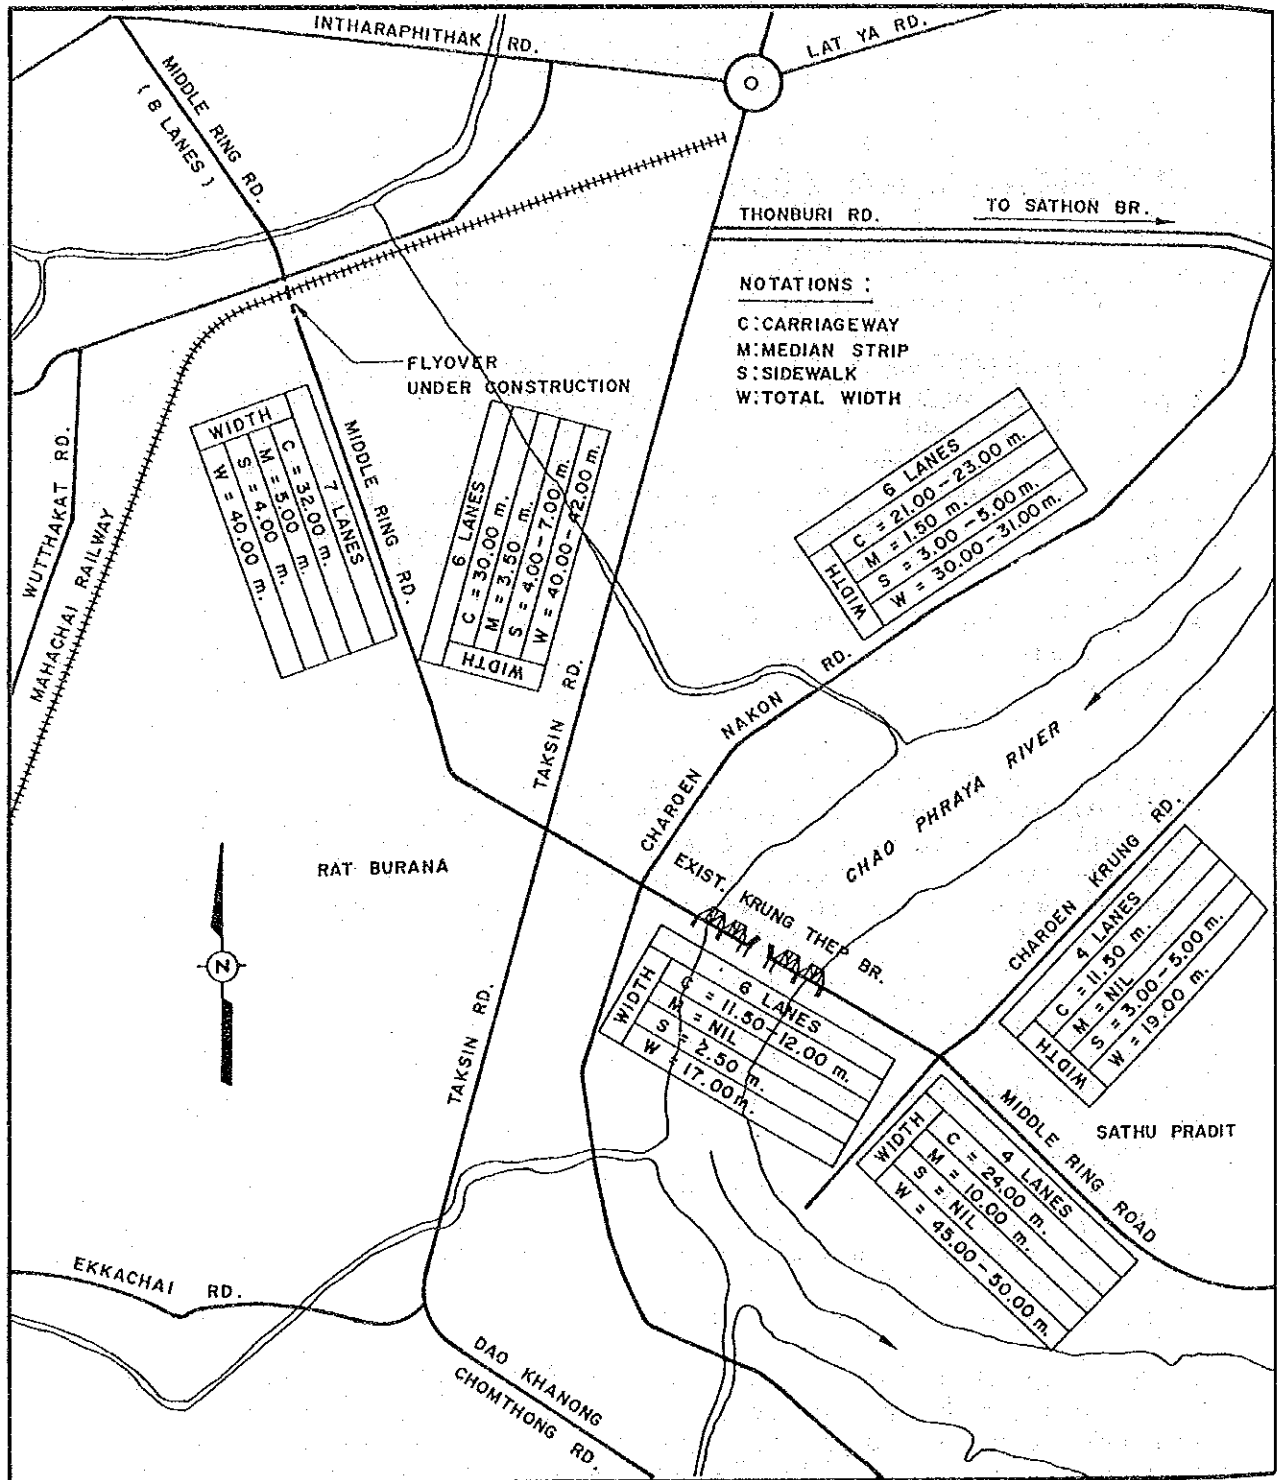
Existing Roads around Krungthep Bridge
